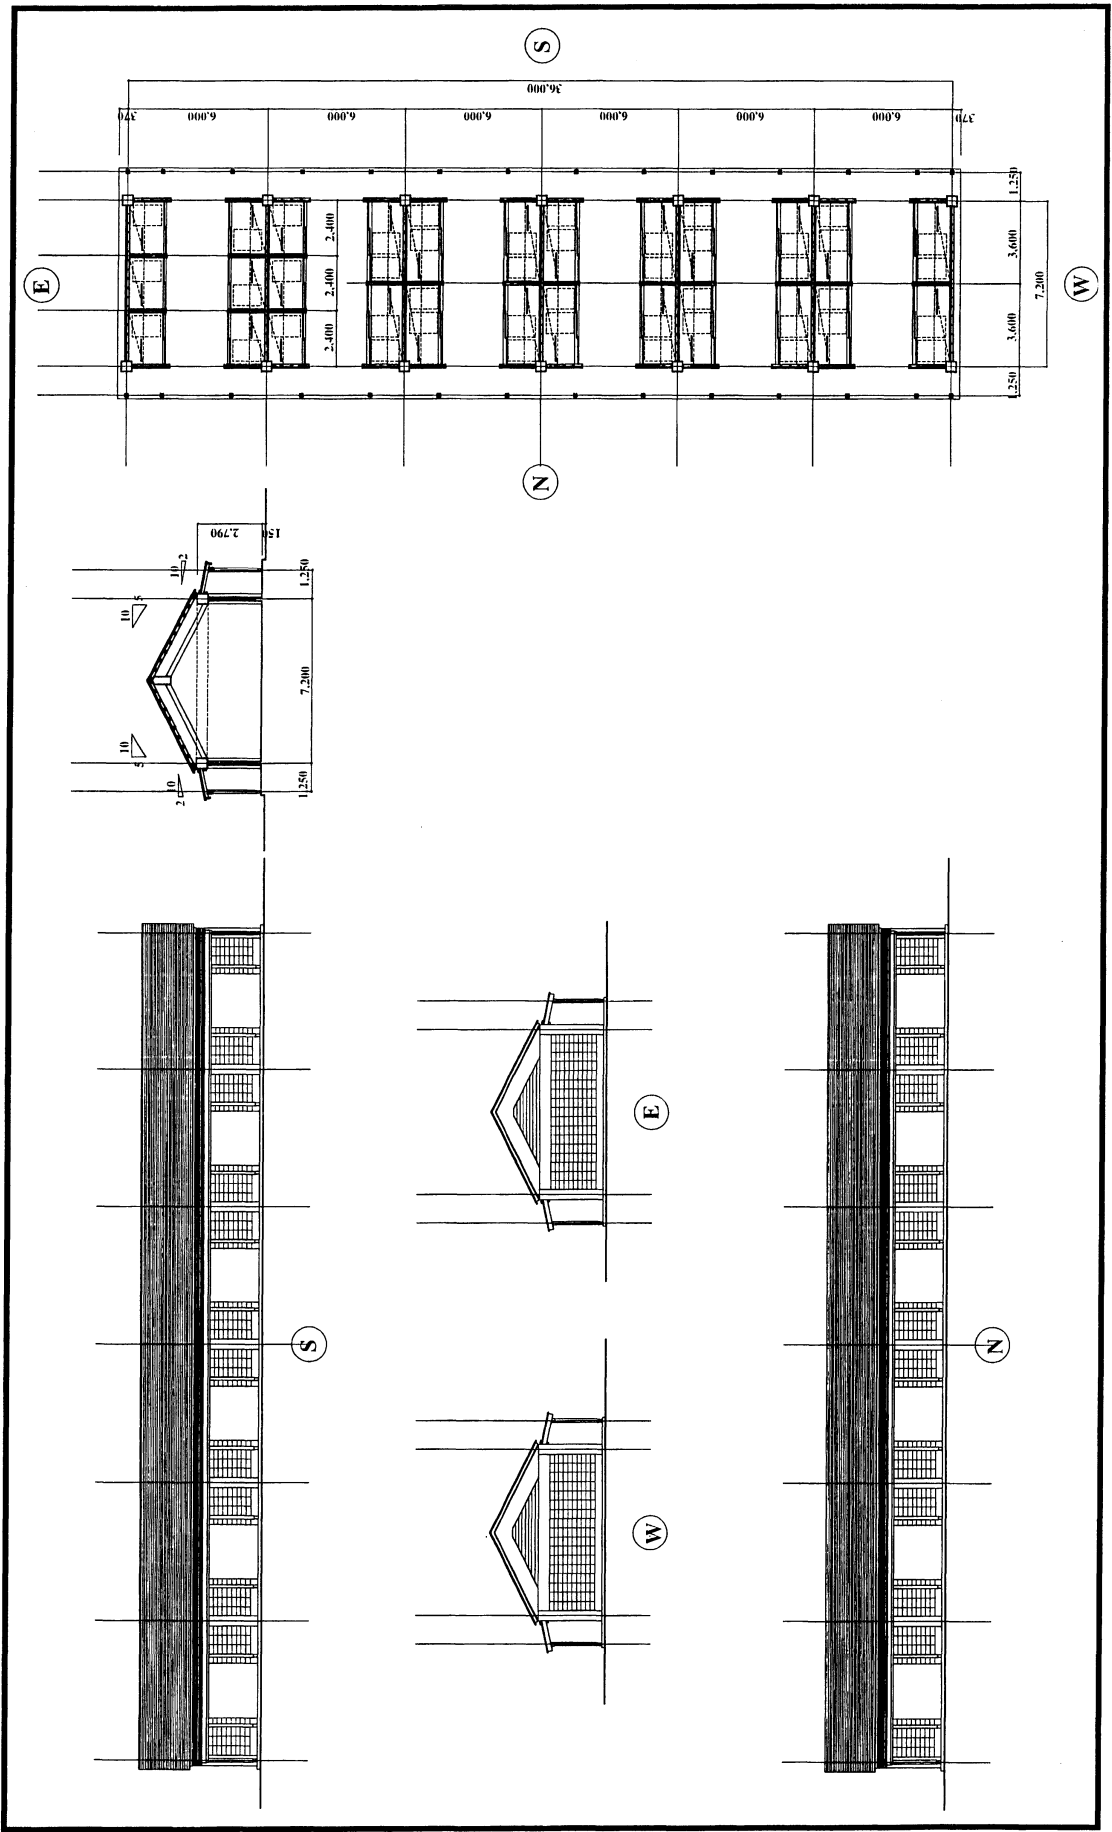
(1) Plan / Section of Gear Locker
